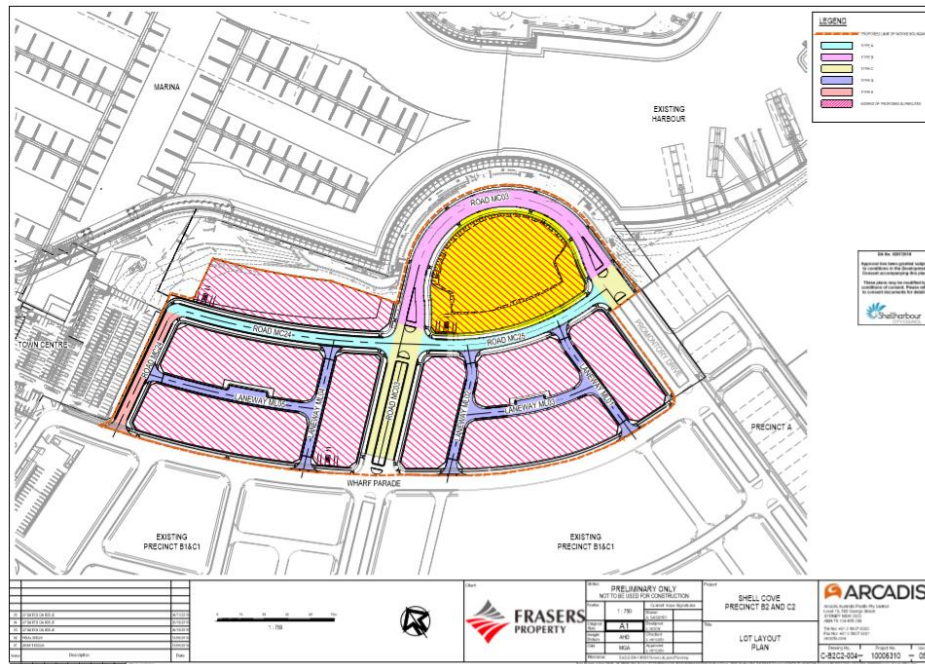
DA0287/2018 – Approved subdivision plan (proposed site highlighted).
